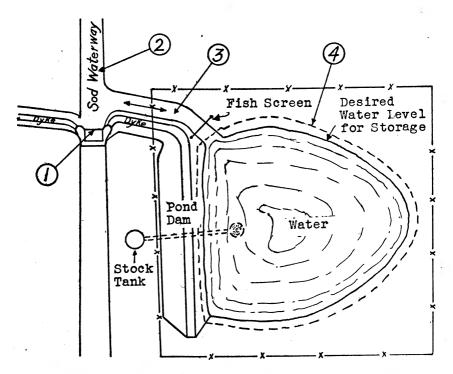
Method of diverting water to a farm pond without carrying all of the excess water through the pond spillway. 1. Permanent structure constructed economically with thin section concrete. 2. Natural waterway, or a well controlled terrace outlet. 3. Spillway channel. 4. Maximum water level in pond.
